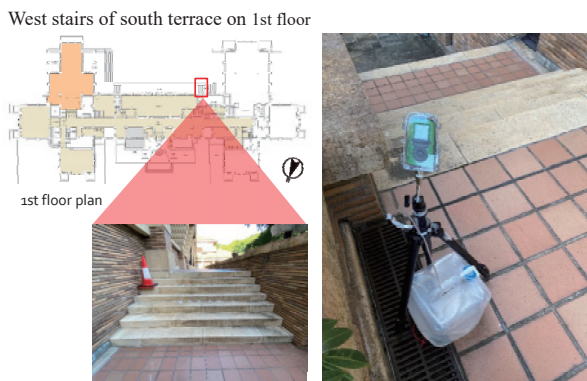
Tatsuyama stone microenvironment survey (south terrace west stairs on the first floor) the measured point in the 1st floor plan (left) and condition (right)
